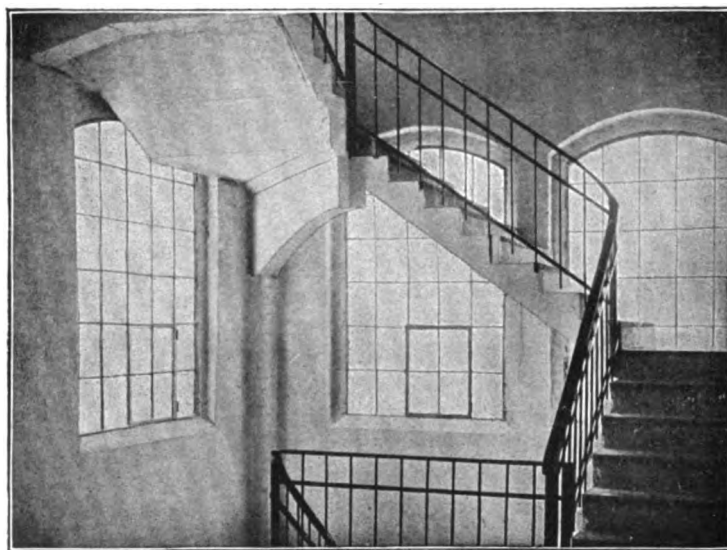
Reinforced concrete stairs in the storehouse of the National Railway, Elberfeld in Opladen.
